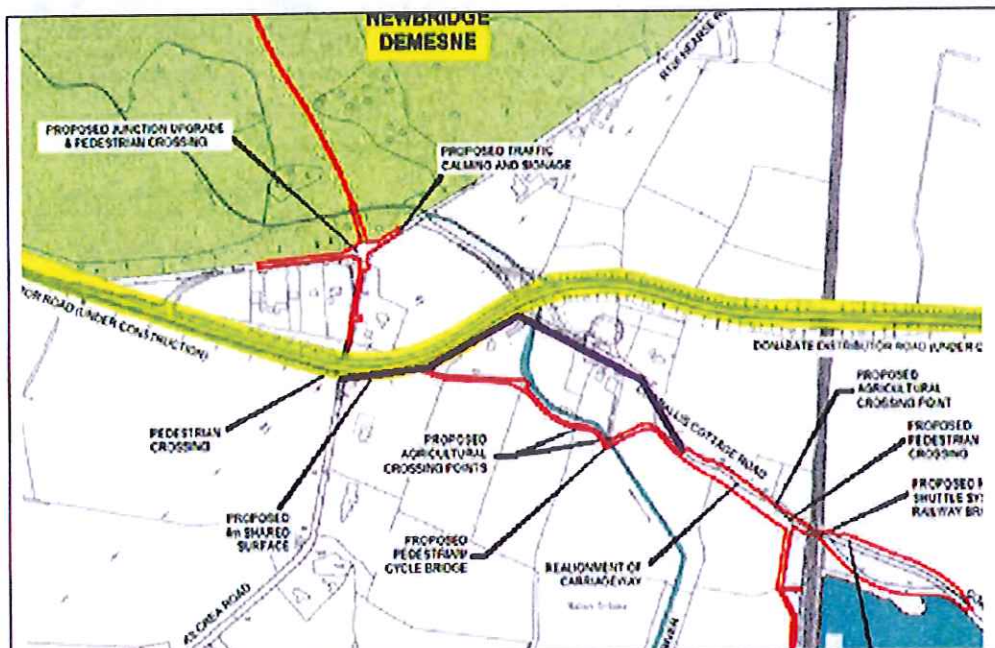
Image showing the 'preferred' route option (red) and the alternative route (purple), which has been examined in the EIA, but would avoid severing Jack Sheehan's farm and would obviate the need to constructing a new road/cycleway through agricultural High Amenity zoned lands.
